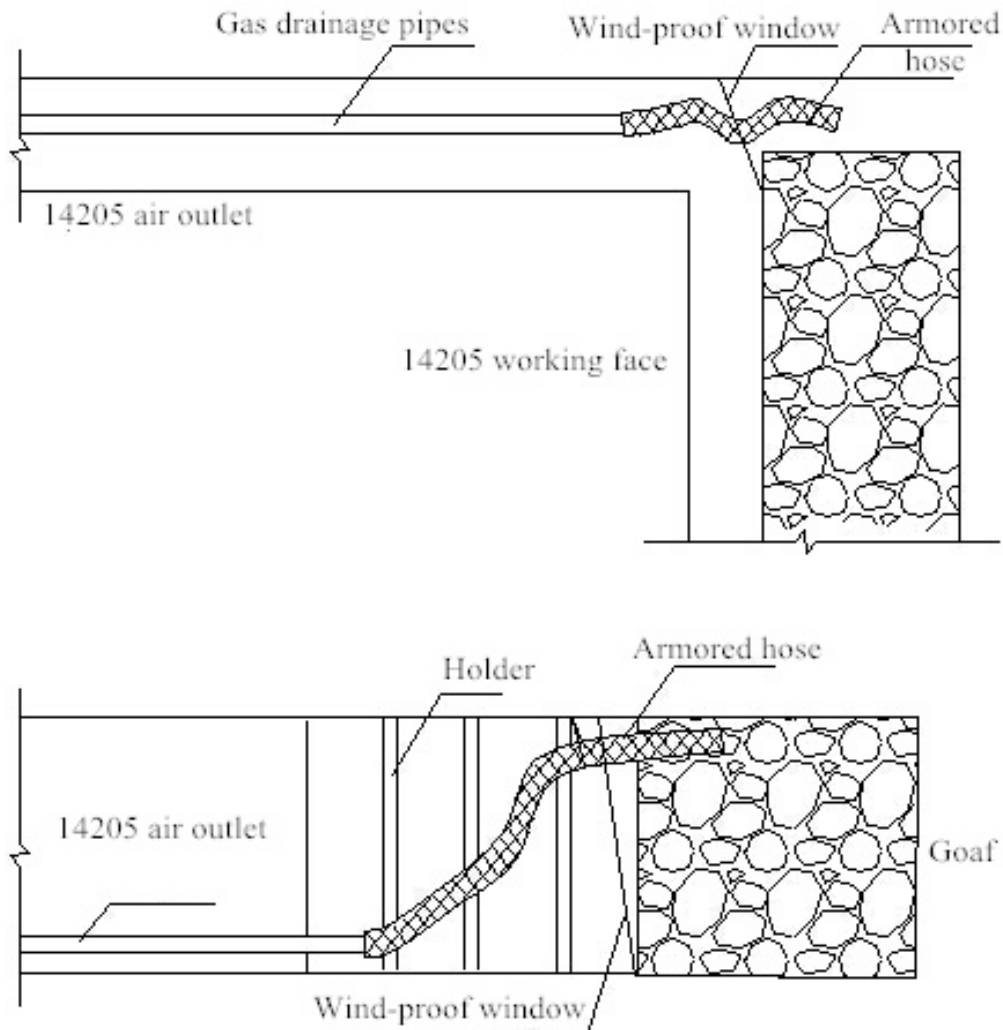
Gas drainage layout in the working face and upper corner
